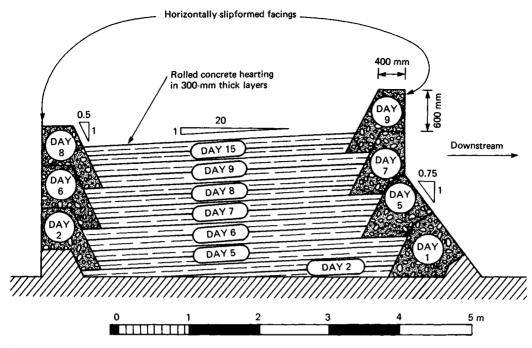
Milton Brook trial bank: roller-compacted concrete between slipformed kerbs
